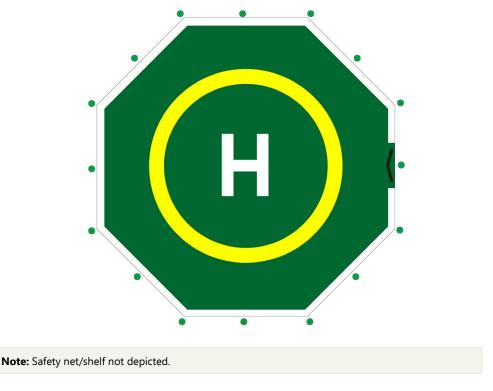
Octagon shaped TLOF helideck Perimeter Lighting arrangement
